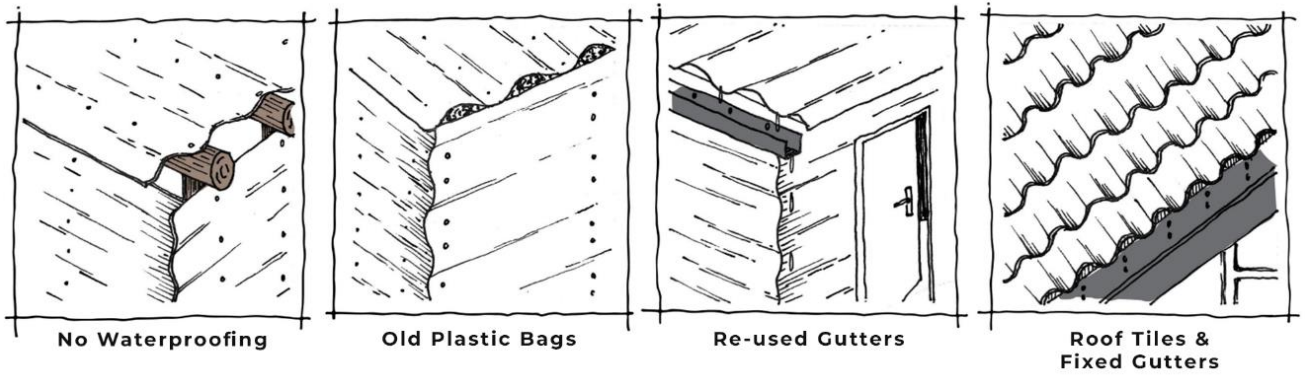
Sketches of Observations made on waterproofing methods used by Melusi Residents (UUC 2023)
